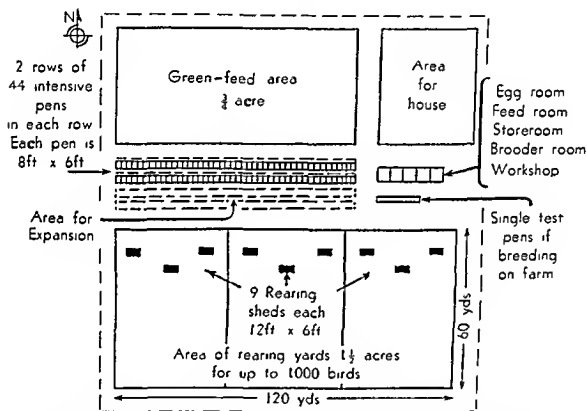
Suggested intensive farm layout using small-unit, intensive laying pens and range-rearing quarters. The unit shown would accommodate 1000 birds, but could take 1500 or more. Area is approximately 3 acres, but this could be reduced to $1\frac{1}{2}$ if intensive rearing quarters were used.
